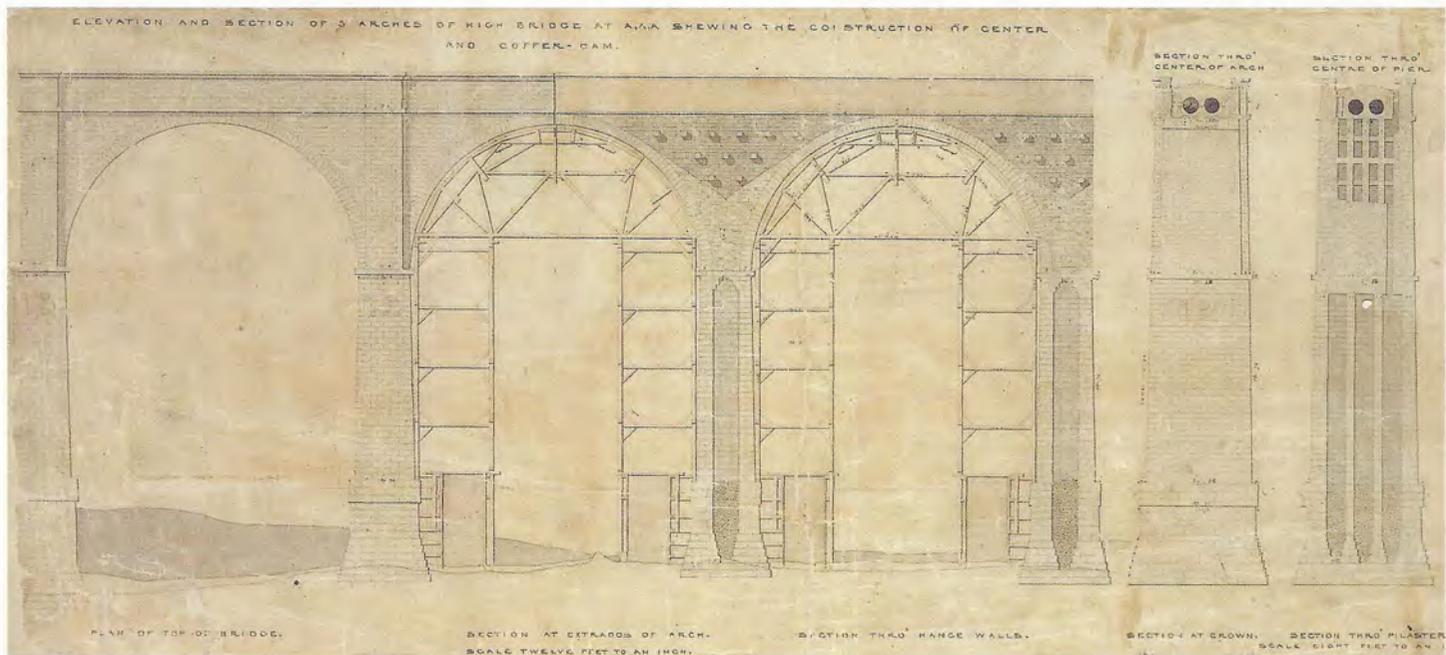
High Bridge. Cross sections and partial elevation showing cofferdams and centering for arch construction. c. 1845.
